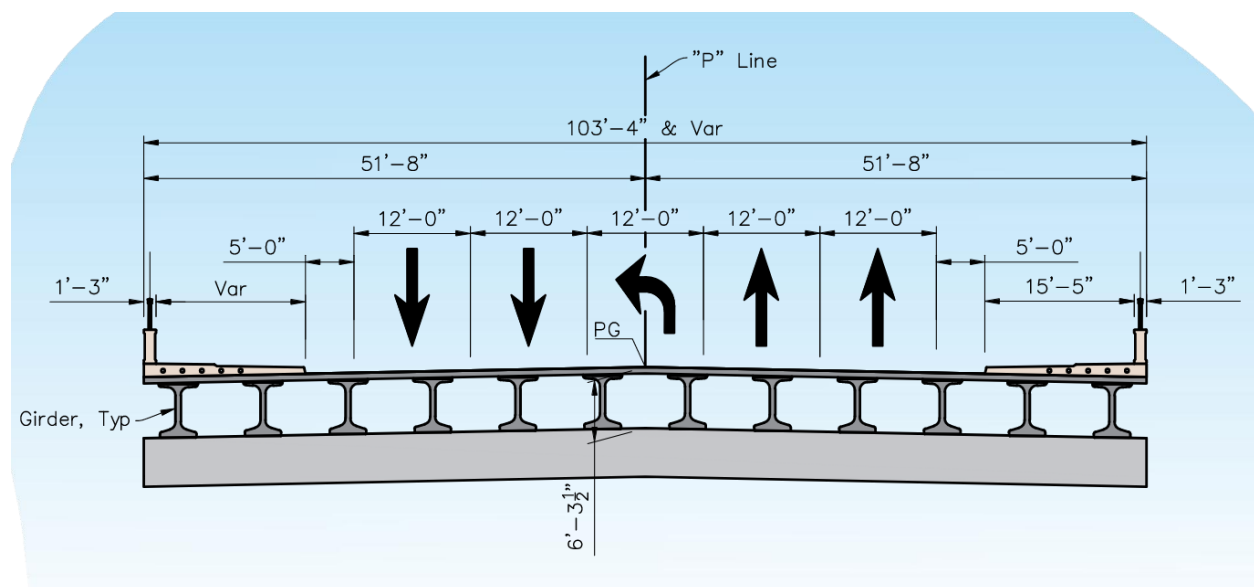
Typical Roadway Section for the Preferred Alternative along Prado Road
